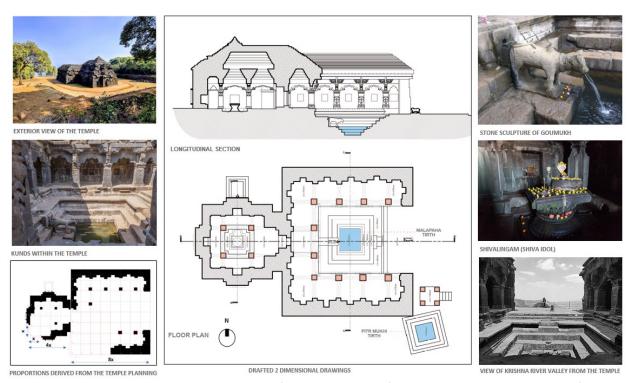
Images and Detailed drawings of Krishnabai temple (captured and developed by author)
